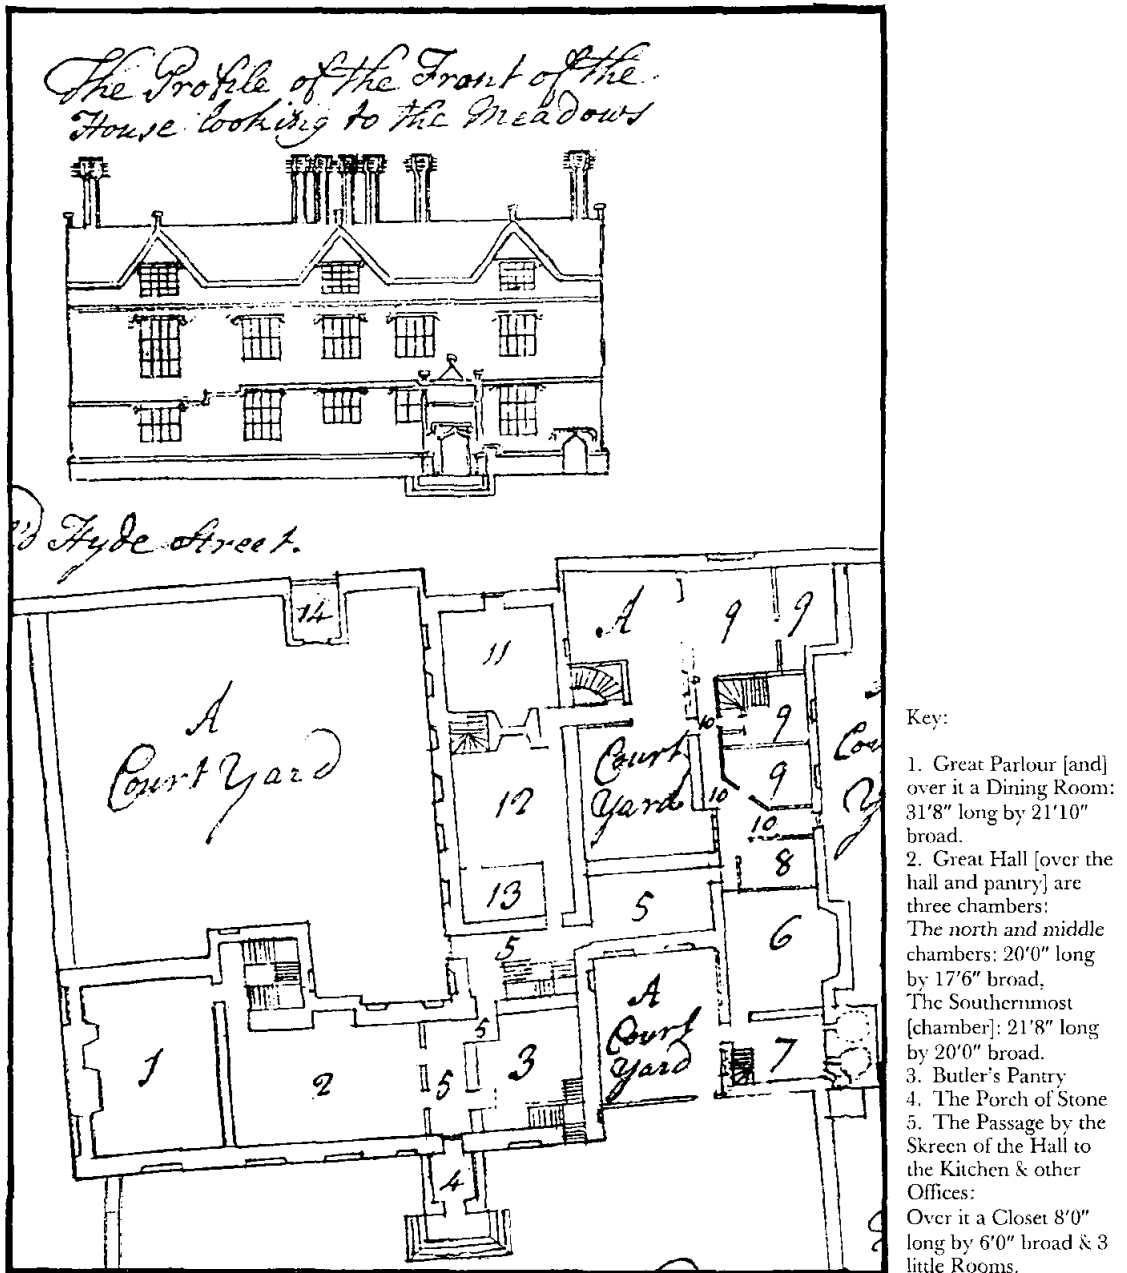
An elevation and plan of Hyde House, Winchester, c. 1750. (HRO M/26). (Hampshire Record Office)
